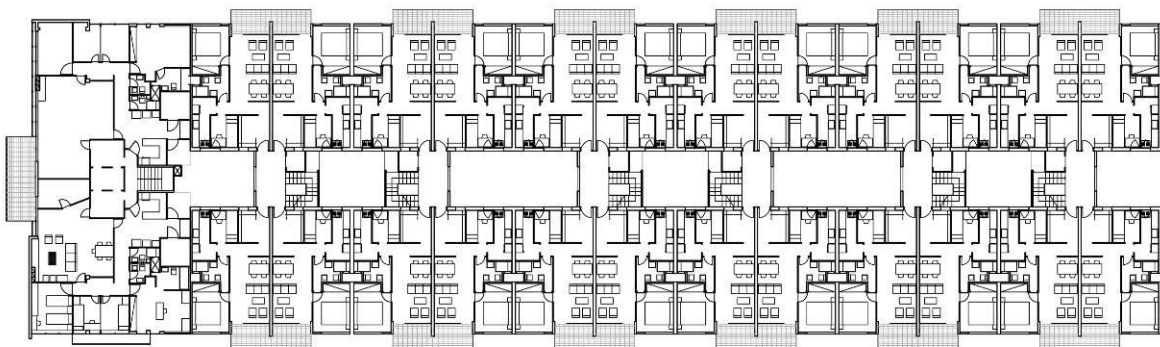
F. Barba Corsini: Mitre Building, Barcelona. Typical plan. Source: Redraw by M. Lucchini.
